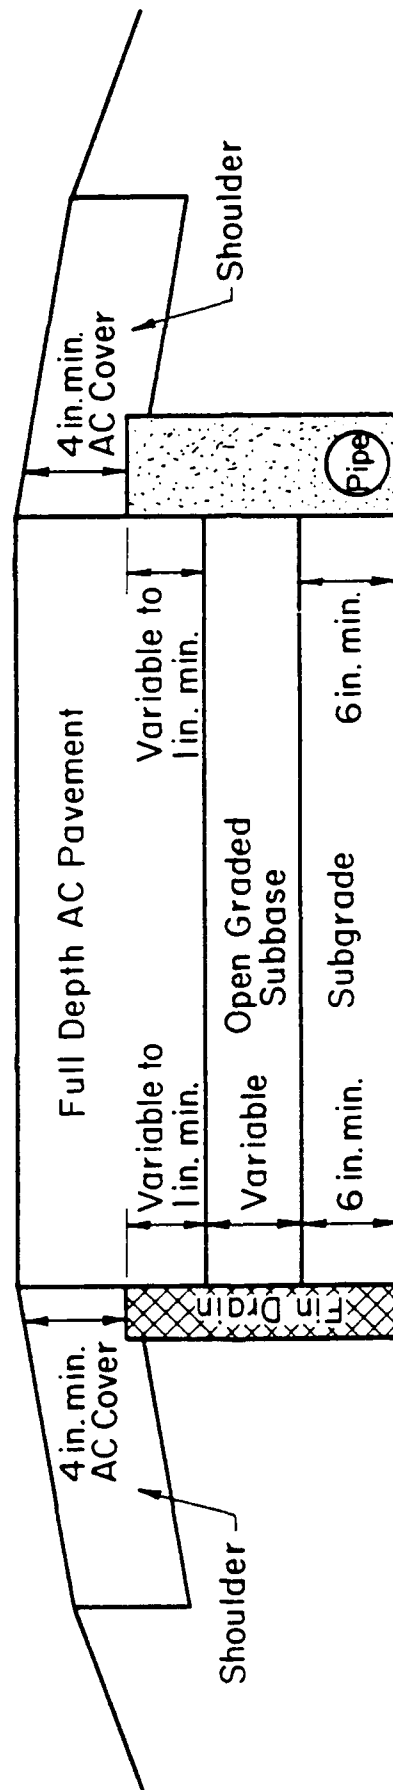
Subsurface Drainage System Location in Asphalt Concrete Pavements.
